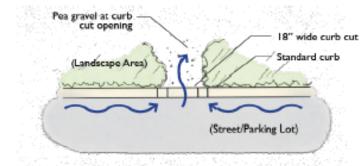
Standard curb cut: plan view (Source: SMCWPPP 2009)
